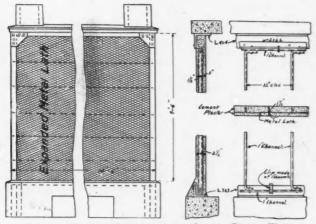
Details of Metai Lath and Cement Plaster Walls of Test House.
